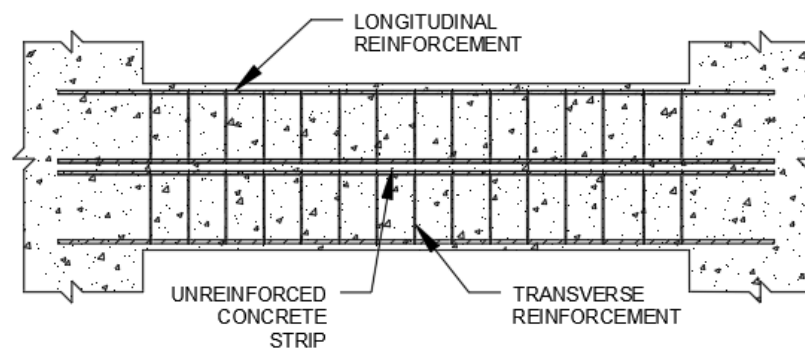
Reinforcement layout in “double-beam” coupling beams (wall reinforcement omitted for clarity)
